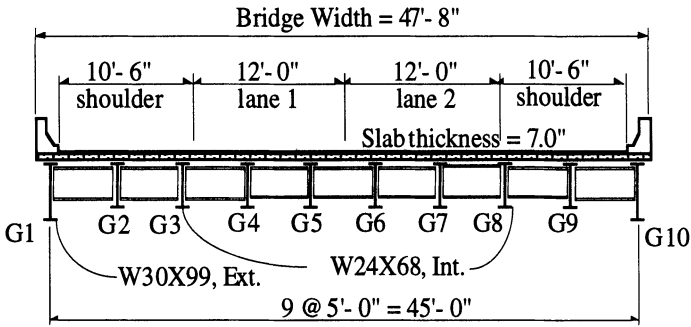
, I-94/Pierce Road Eastbound Section Looking West.
